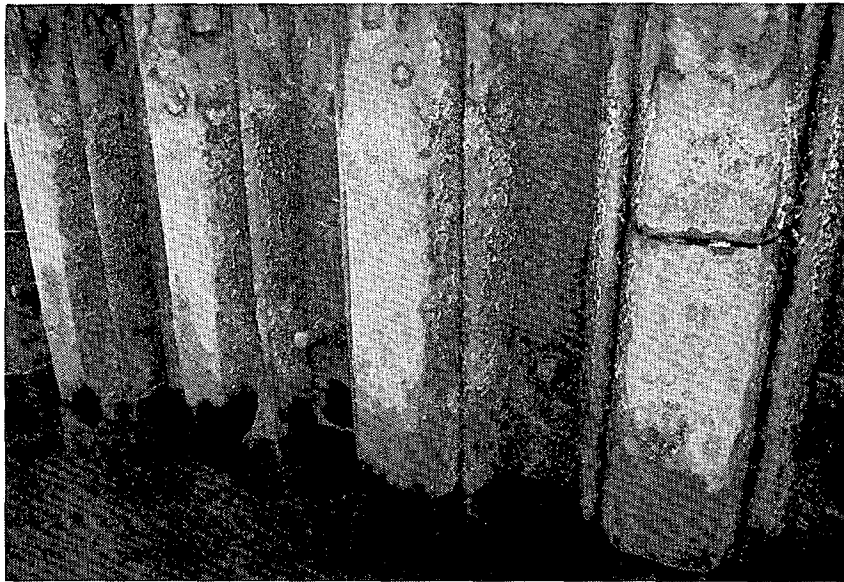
DETERIORATED STEEL SHEETPILE BULKHEAD
